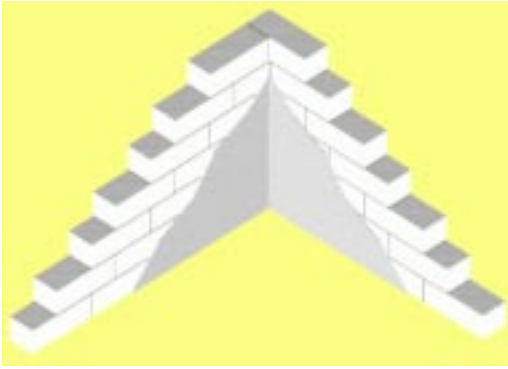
The analyzed wall structure in detail 12.5 mm exterior grade acrylic stucco, a 198.4 mm aerated concrete block and a 6.35 mm interior gypsum plaster. The inside surface of the gypsum plaster was coated with a vapor open paint (permeance approximately 200 ng/m²sPa or 4 perms). (Courtesy of Jan Kosny [1999])
